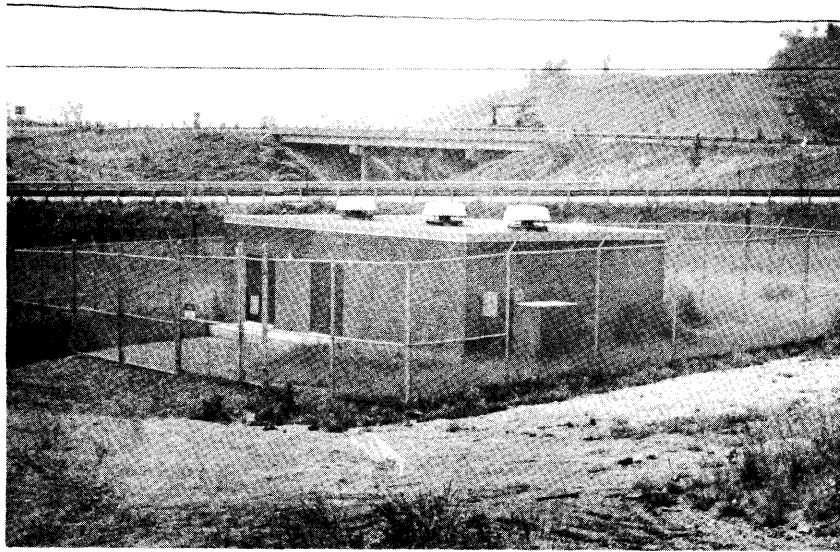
View of building. Note the three exhaust fans on top for cooling.
